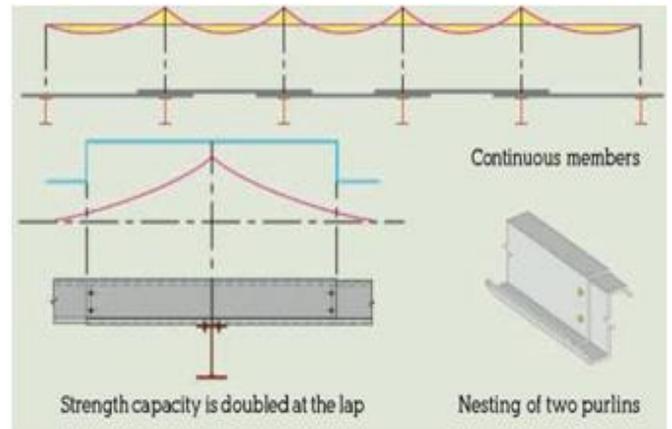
Image courtesy: (Mr. Roshan S Satpute, et. al “Building Design Using Cold Formed Steel Section”)
